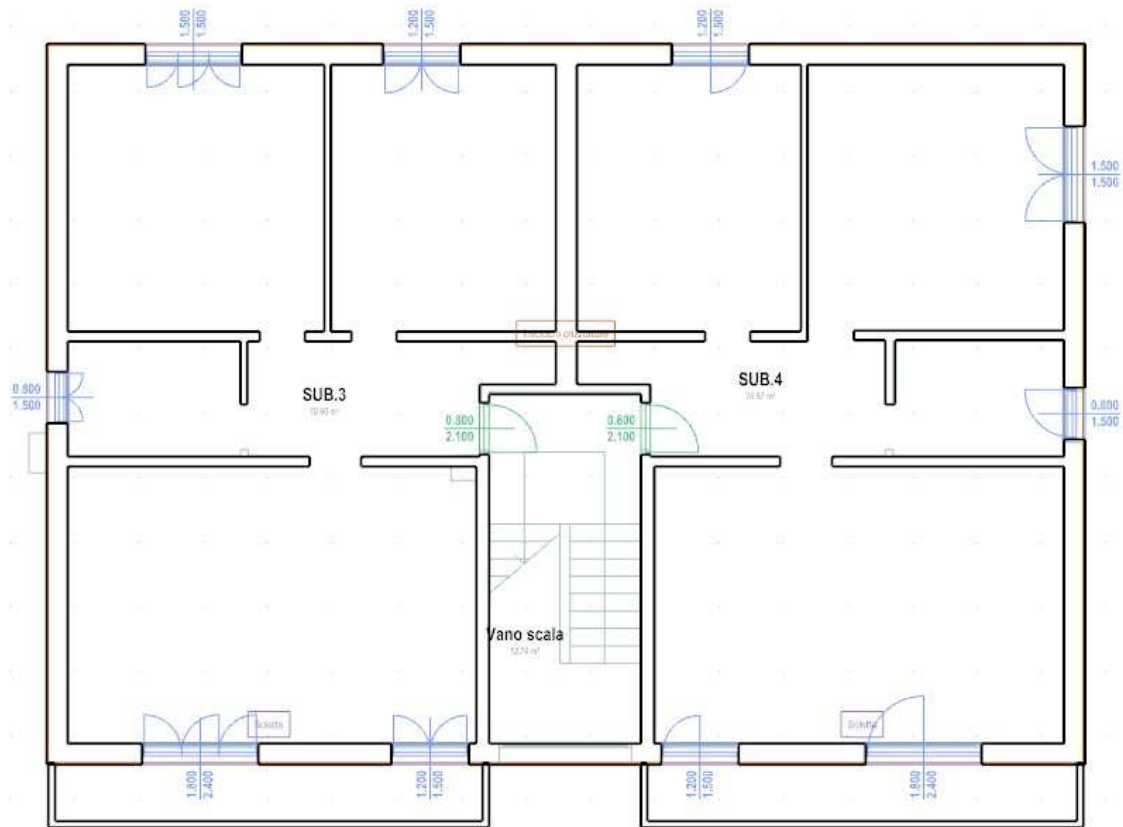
7 Second Floor Plan of the Residential Building (Housing Units SUB.3 and SUB.4 with Central Staircase Access)
